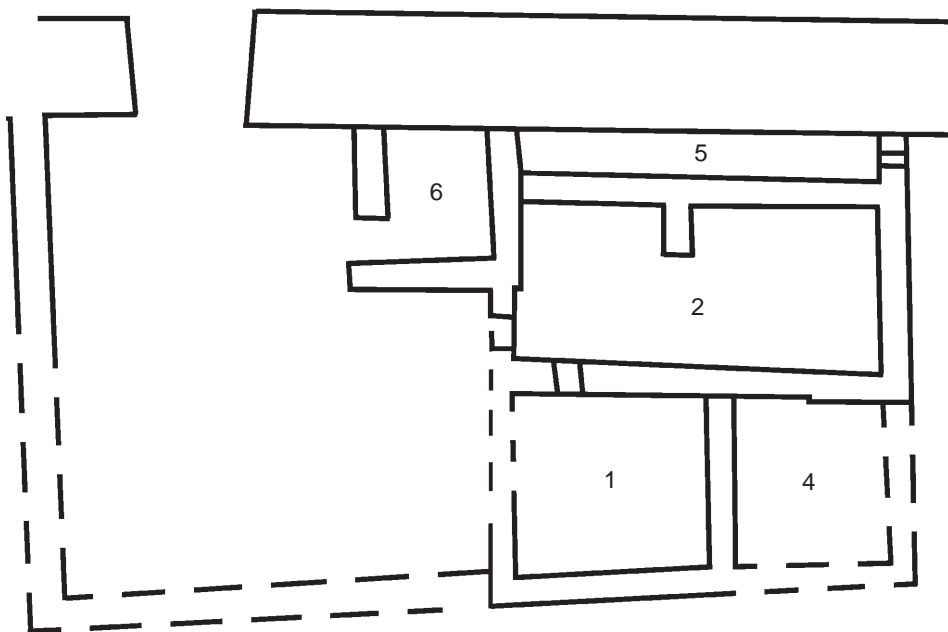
Farmhouse no. 49. Plan of the second building phase.
